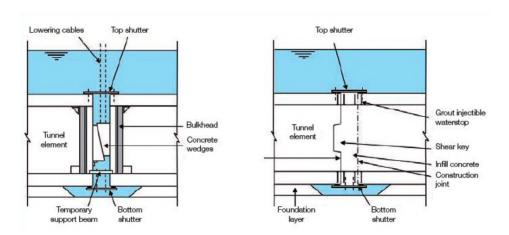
Expansion/ construction joint arrangement (Sinha, 2017)
